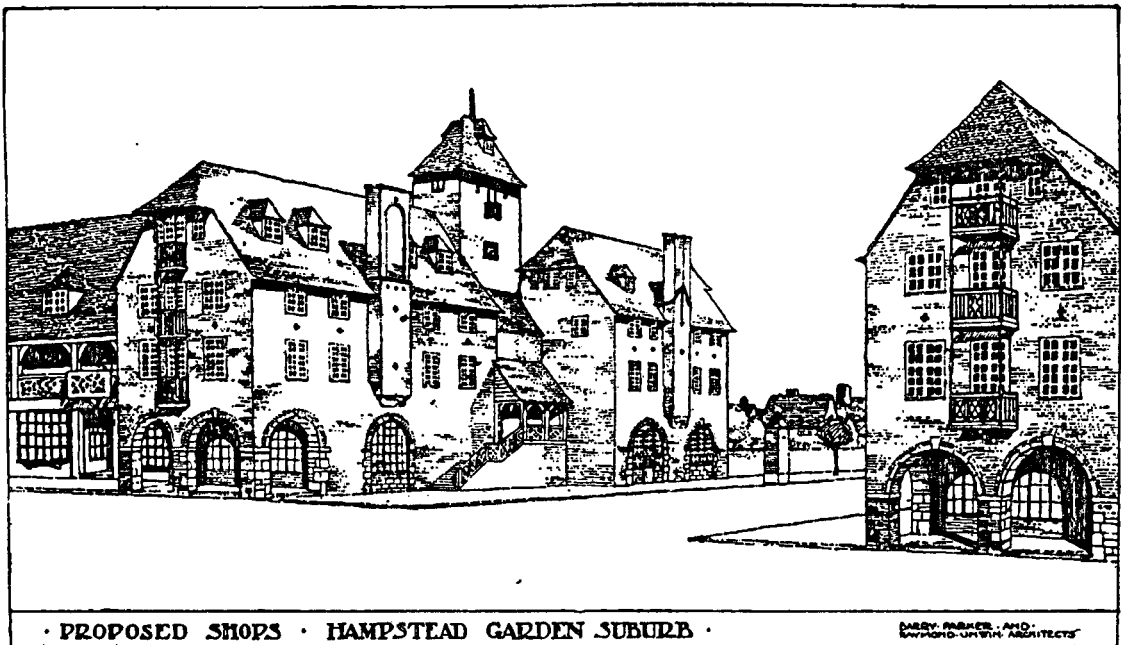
Above-Sketch of Hampstead Garden Suburb shops.
